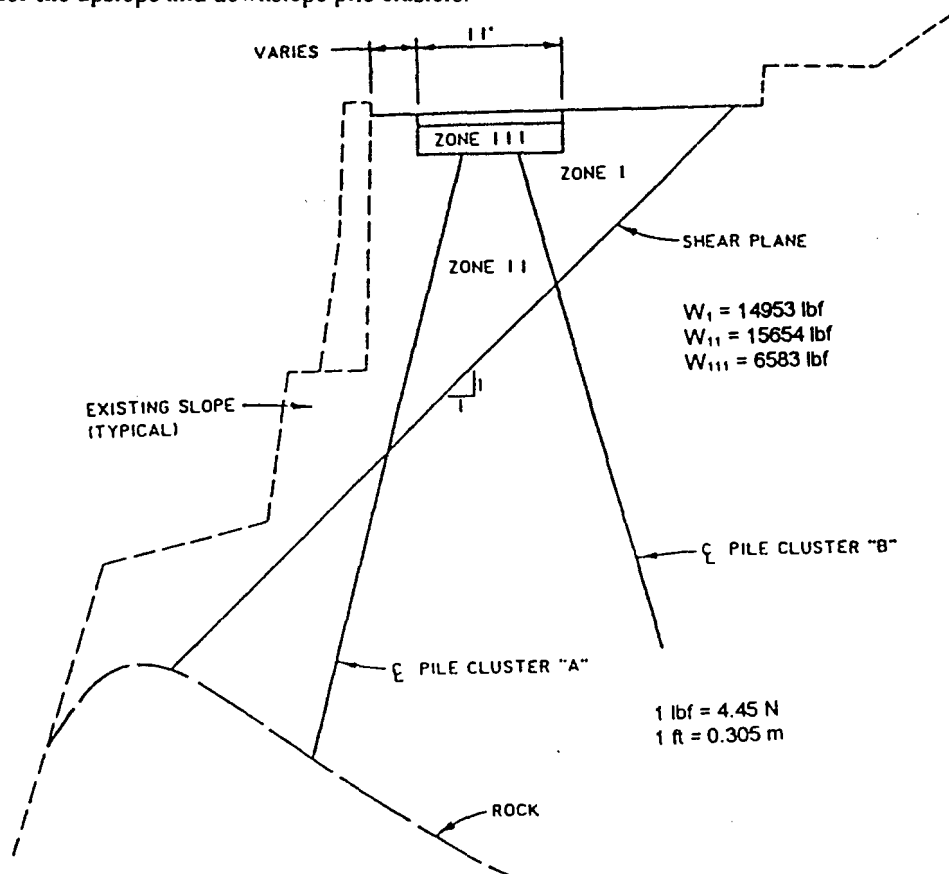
Micropile retaining system for the New York Catskill State Park slope stabilization (Palmerston, 1984).
